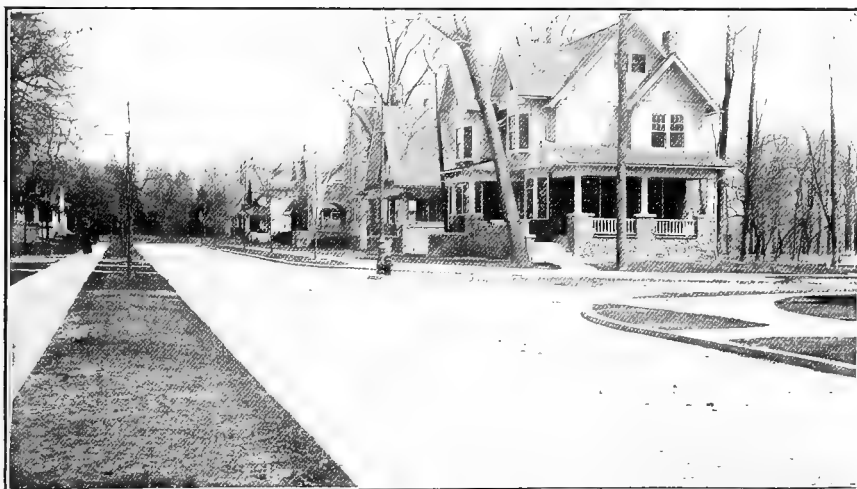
CONCRETE ROAD AT FLUSHING, L. I., N. Y
